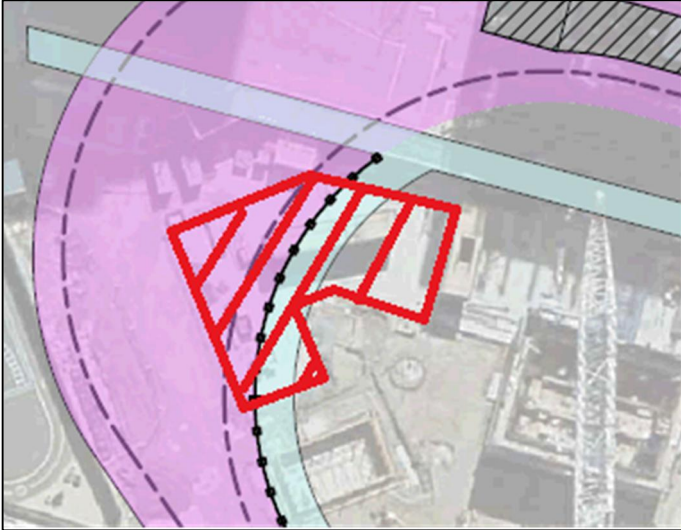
Tram swept path and impact on approved building at 839 to 899 Collins Street
